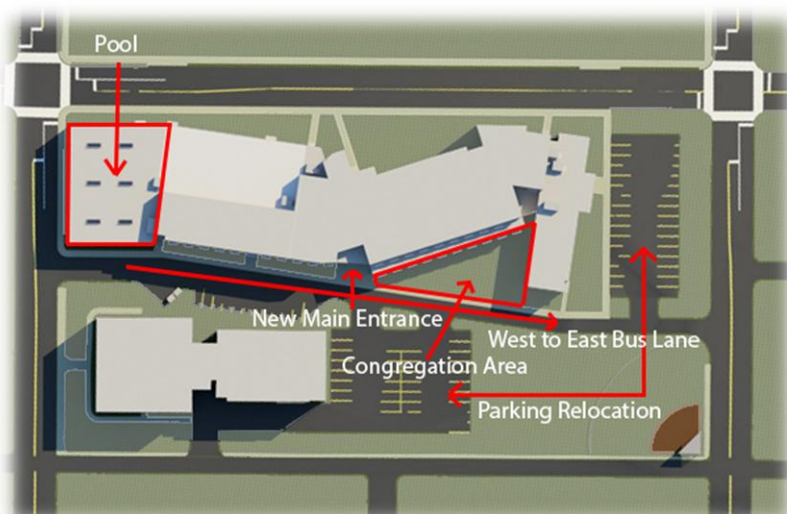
Nexus site plan (building moved east, parking reallocated, pool addition)
